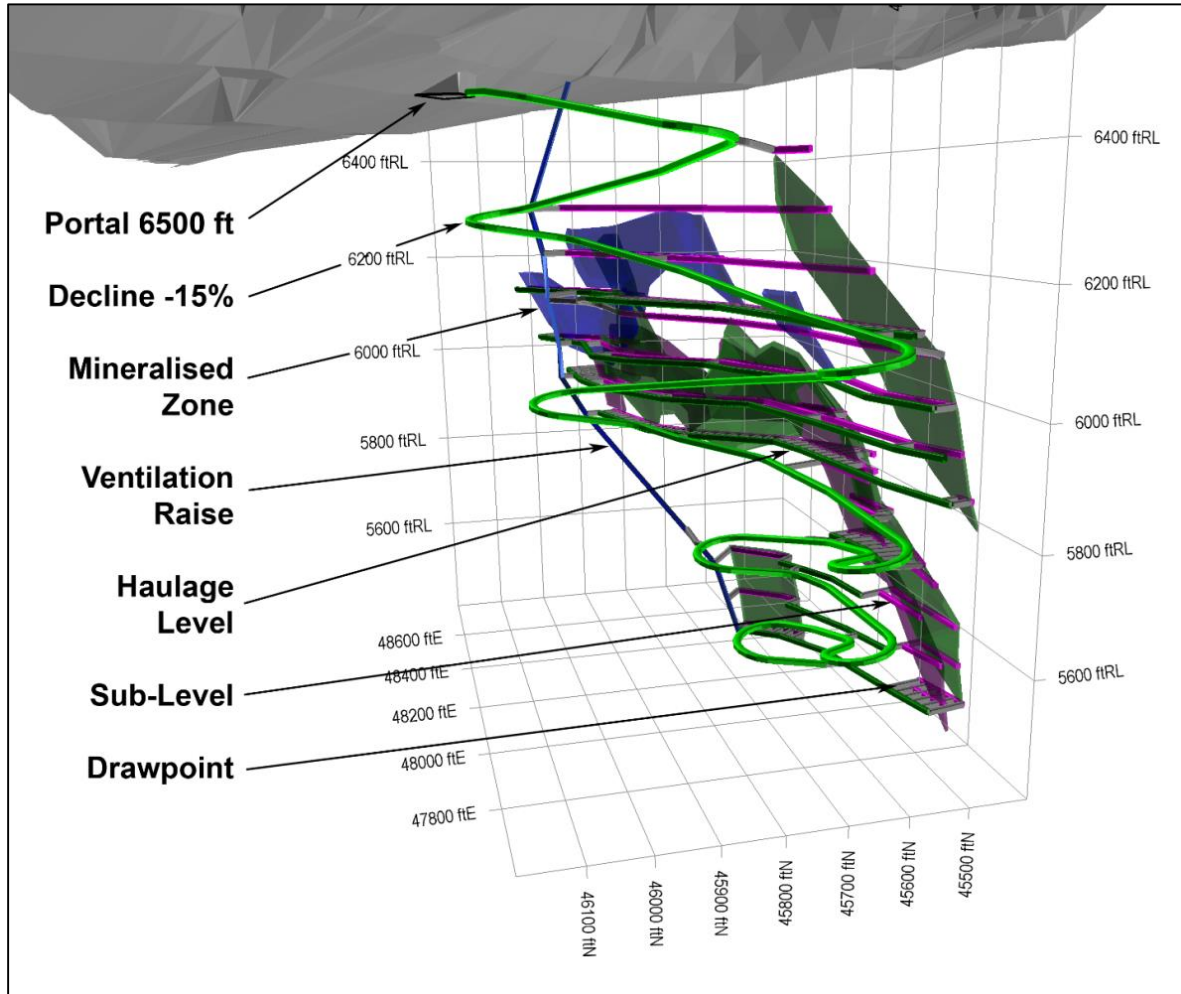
Three-Dimensional View of Dawson Underground Development (facing east)
